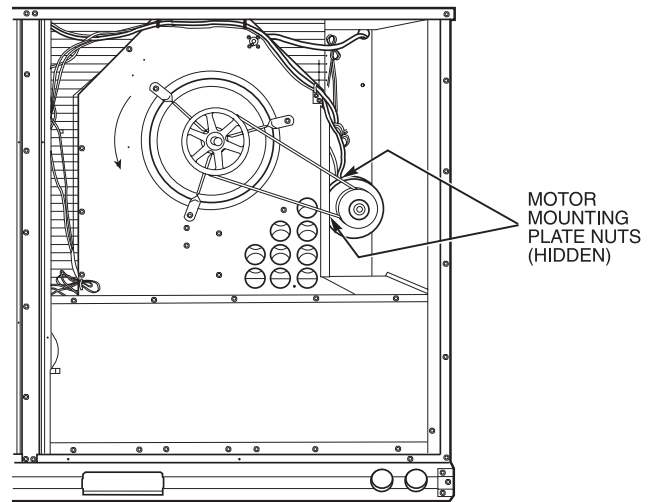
Belt Drive Motor Mounting, 50TFF012,014
